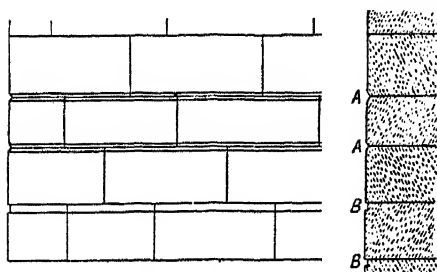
Ashlar Walling, showing: at *A* Chamfered Arrises; at *B* Rebated Arrises.
